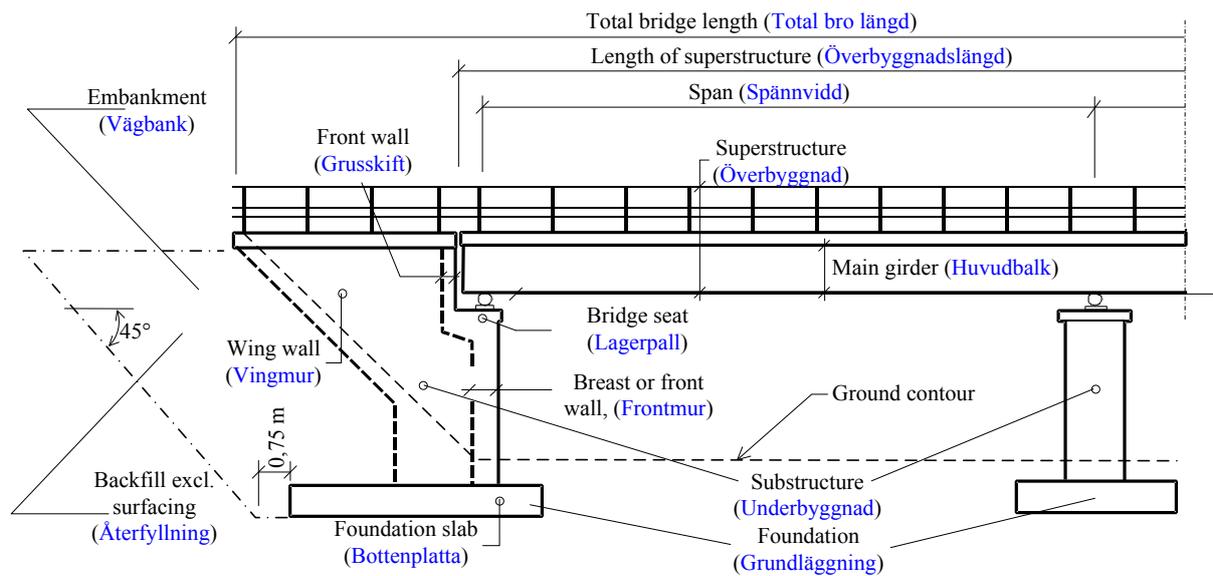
Notations and measures of a typical beam girder bridge with ordinary bearings and expansion joints.
